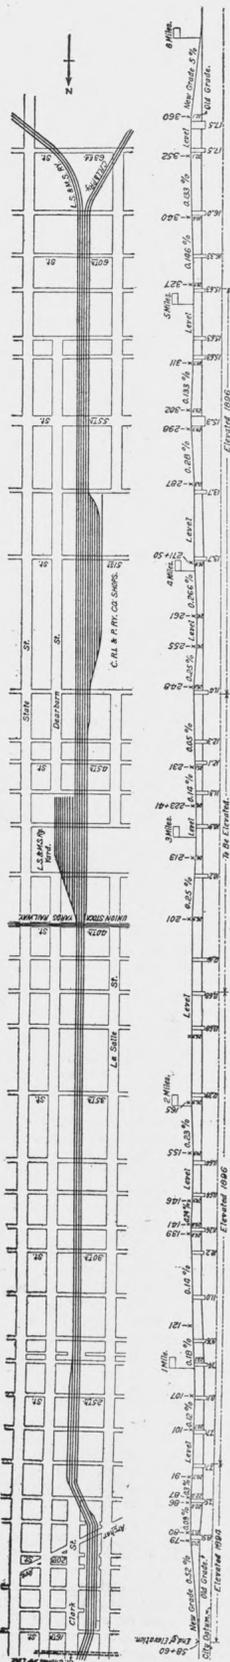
General Plan and Profile of the Track Elevation of the Lake Shore & Michigan Southern, and the Chicago, Rock Island & Pacific, in Chicago.
